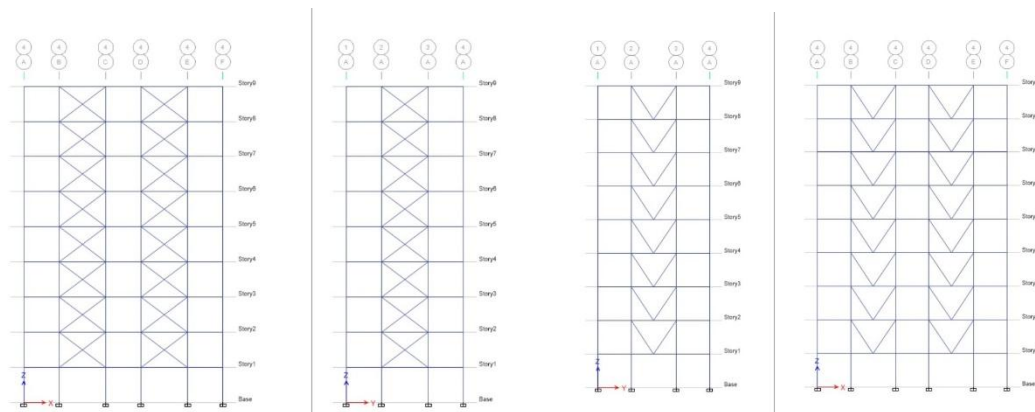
PLAN AND ELEVATION OF X & V G+8 BUILDING
